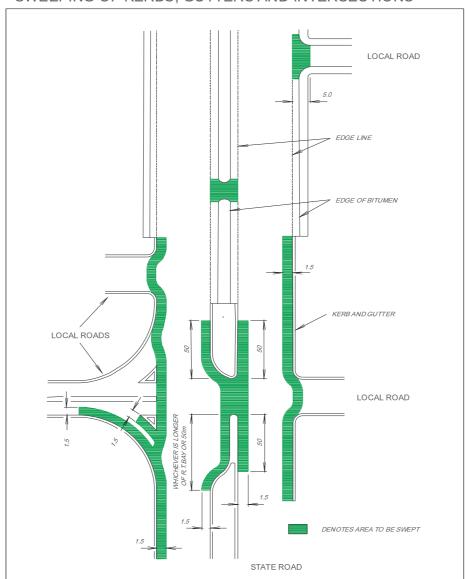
/A.1 – PAVEMENT AREAS TO BE SWEPT
